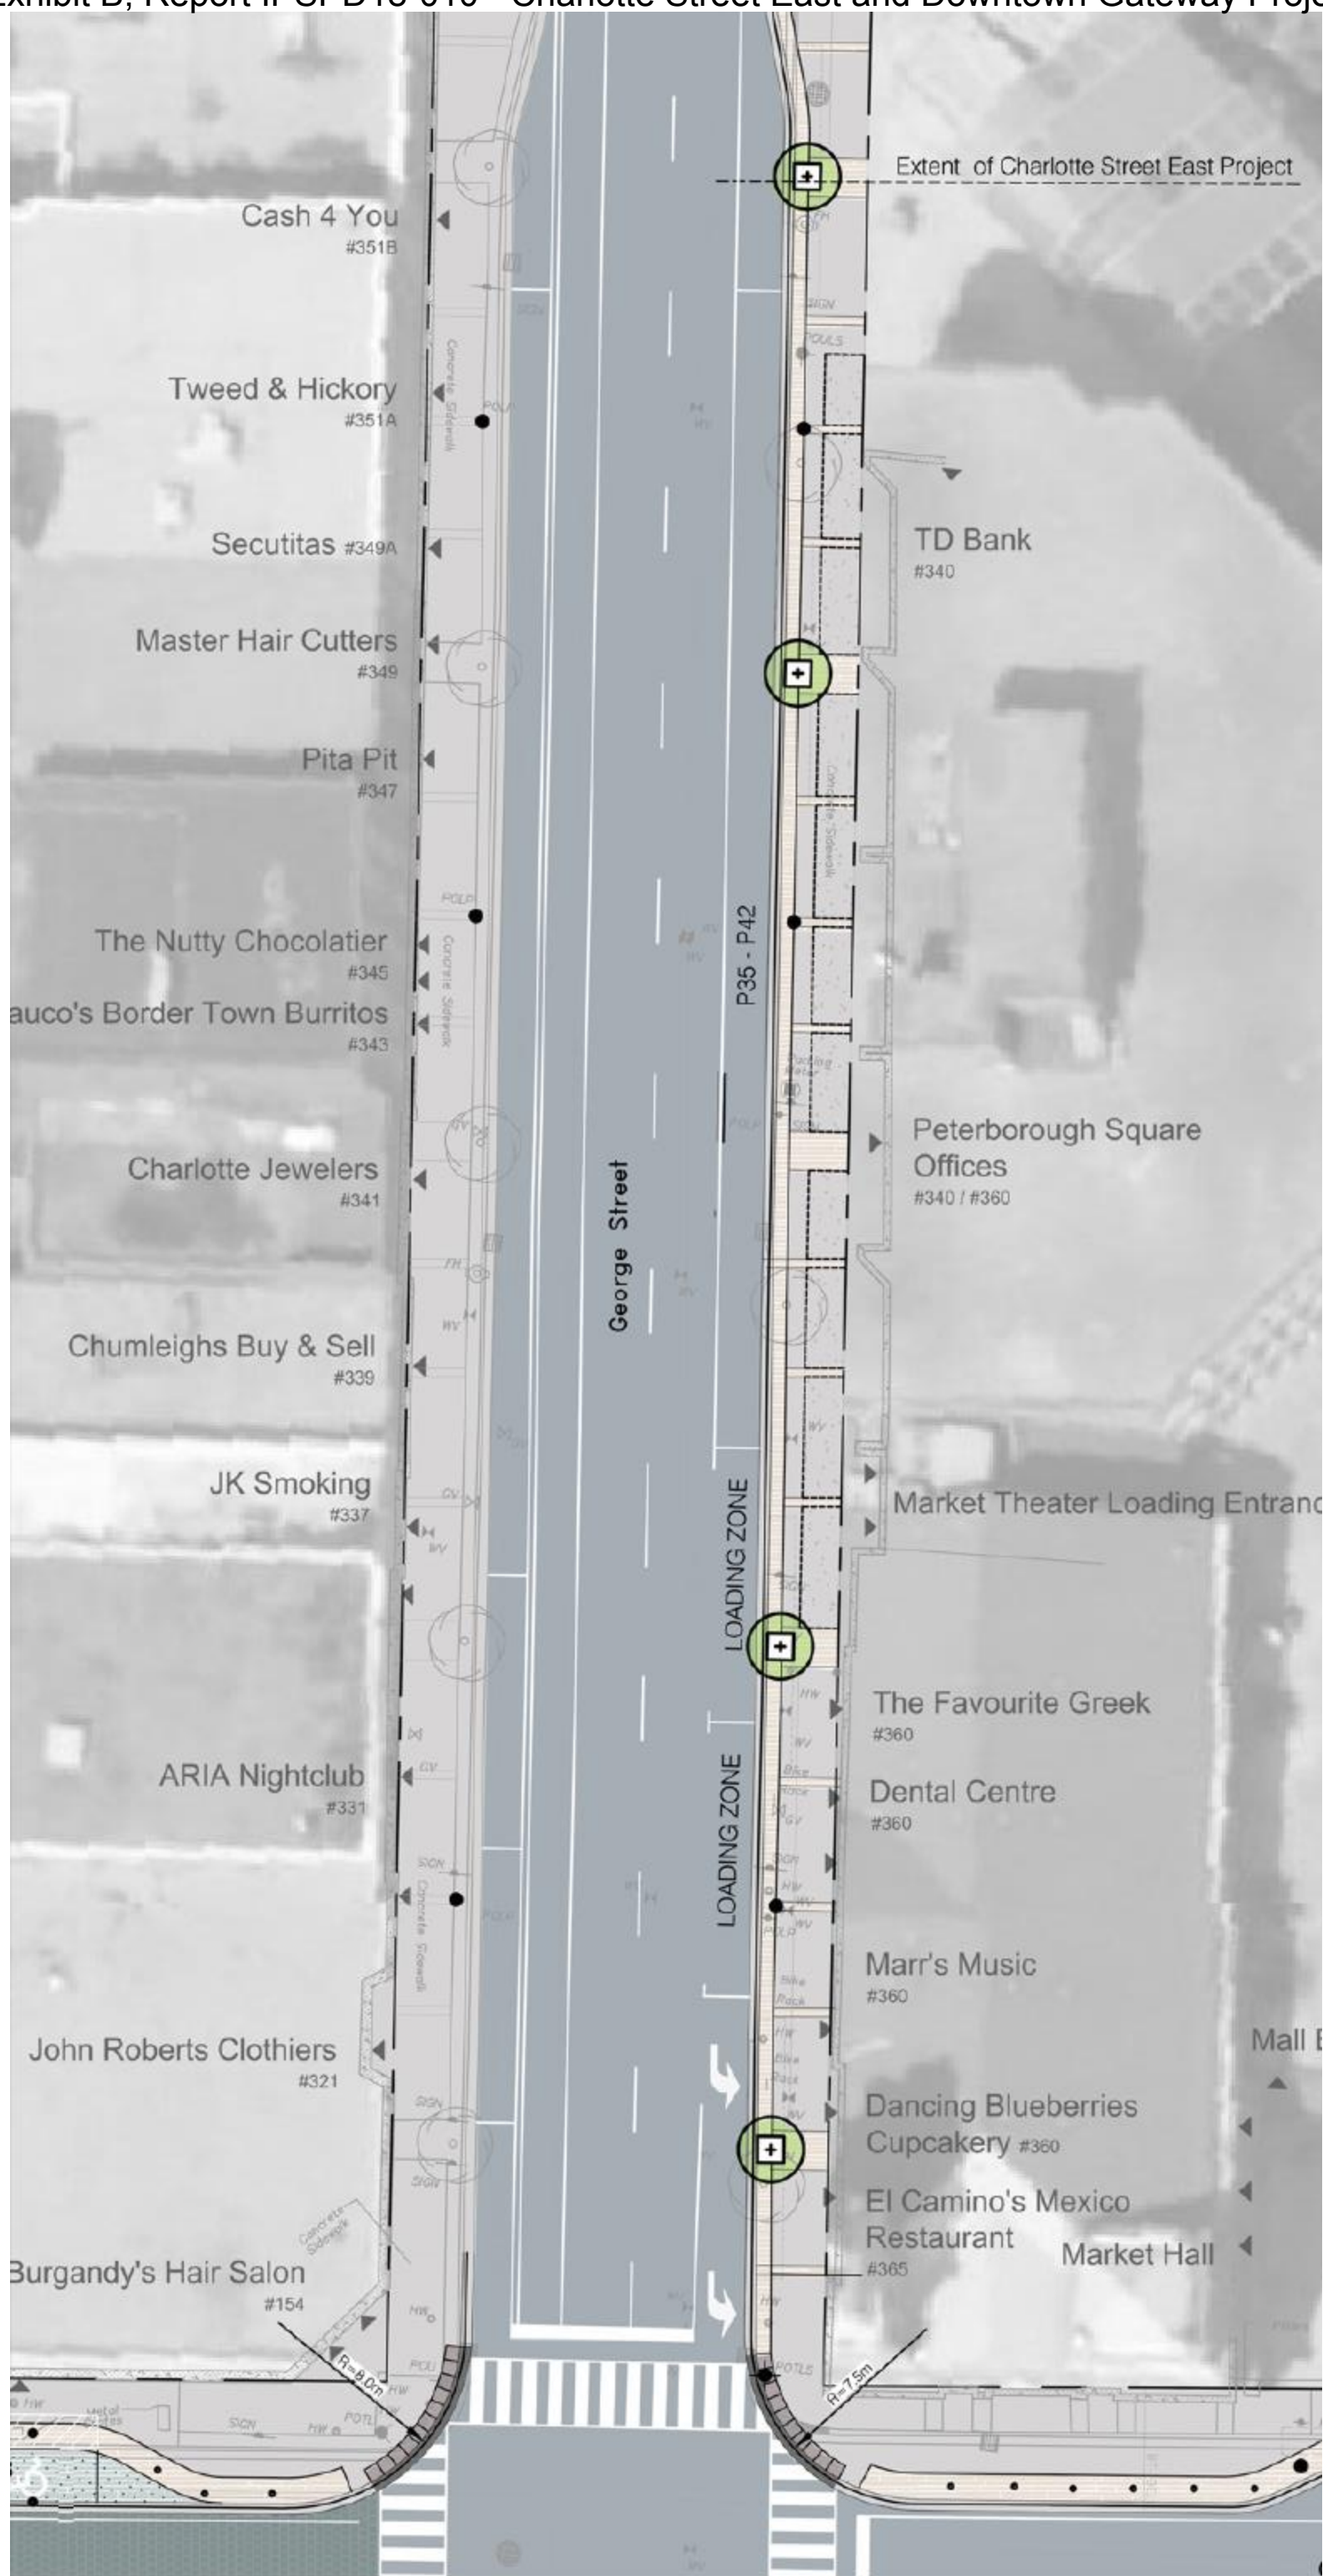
CHARLOTTE STREET PREFERRED CONCEPT PLAN (east section)
